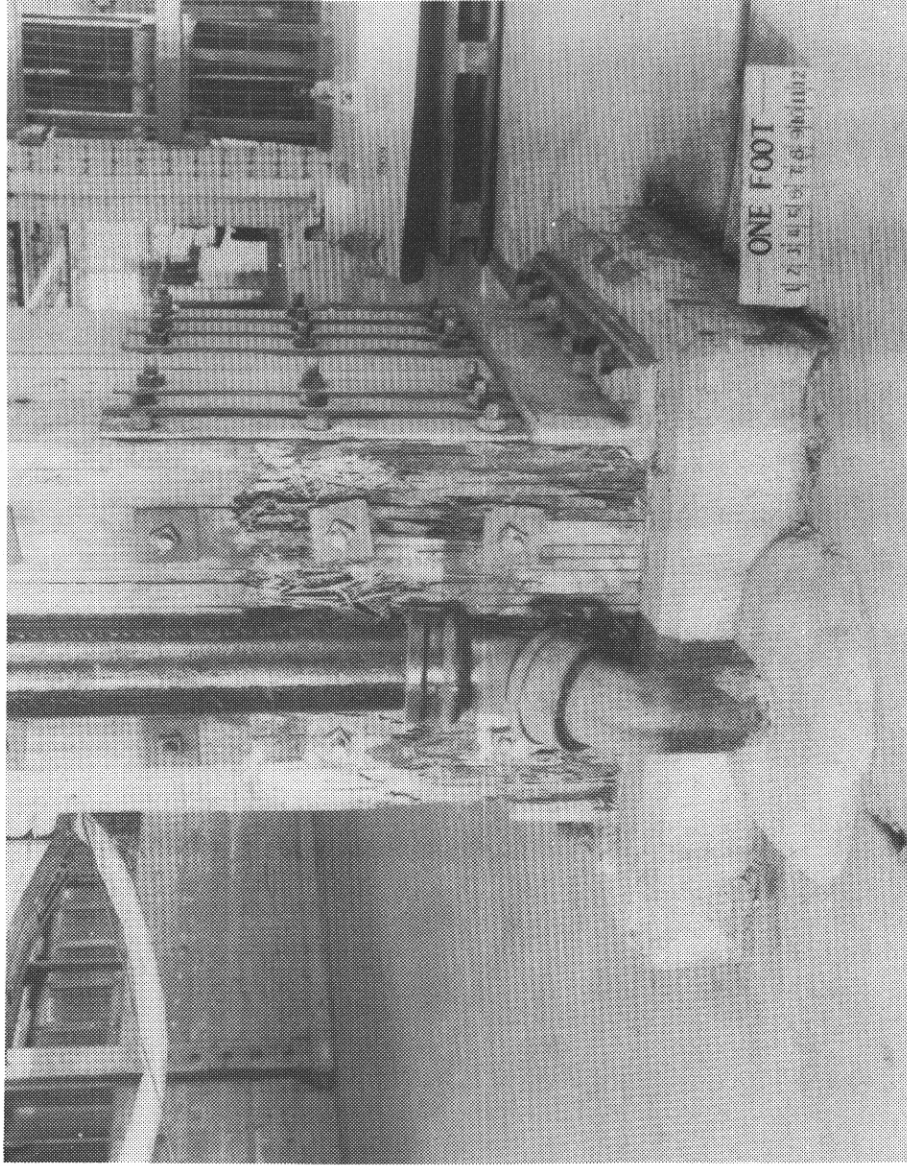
Damage from decay at the base of a structural wood column. Leakage from a drainpipe kept the wood moist.
